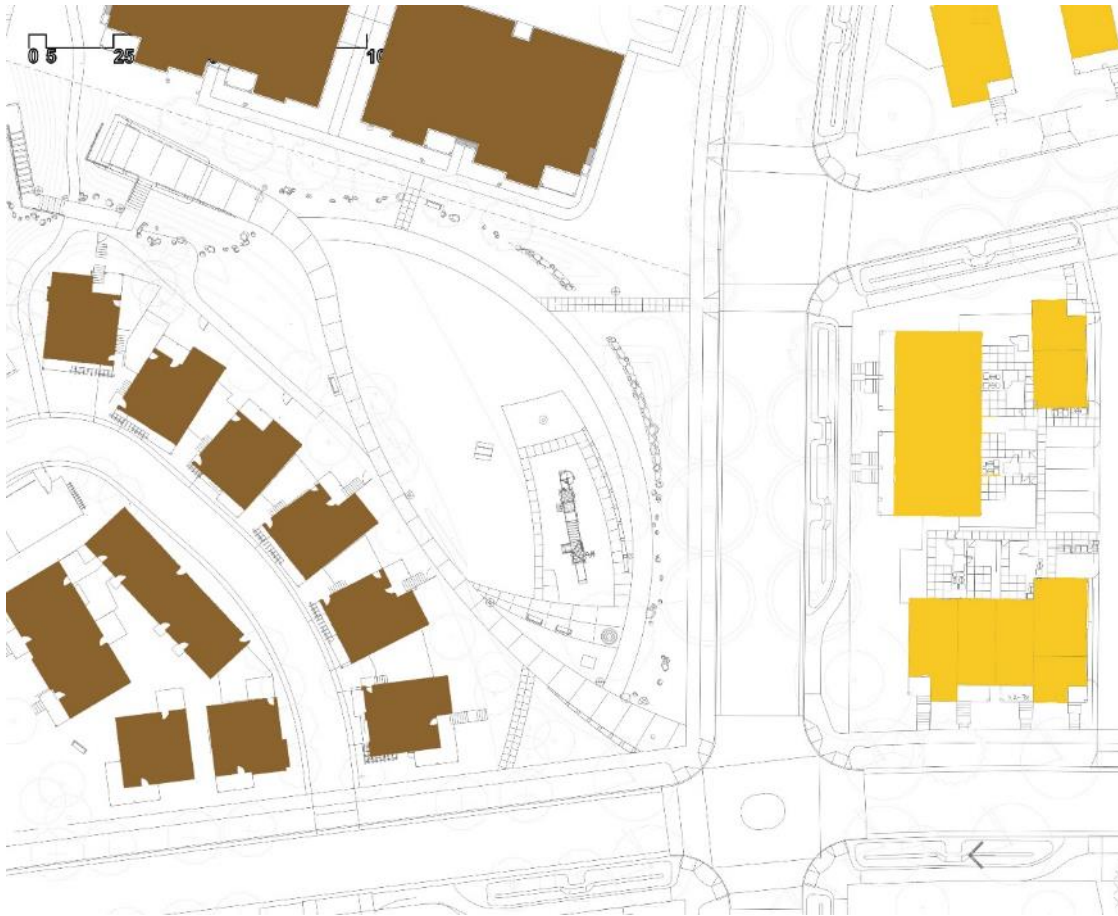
Viewpoint Park site plan. North faces left of page.³⁰
